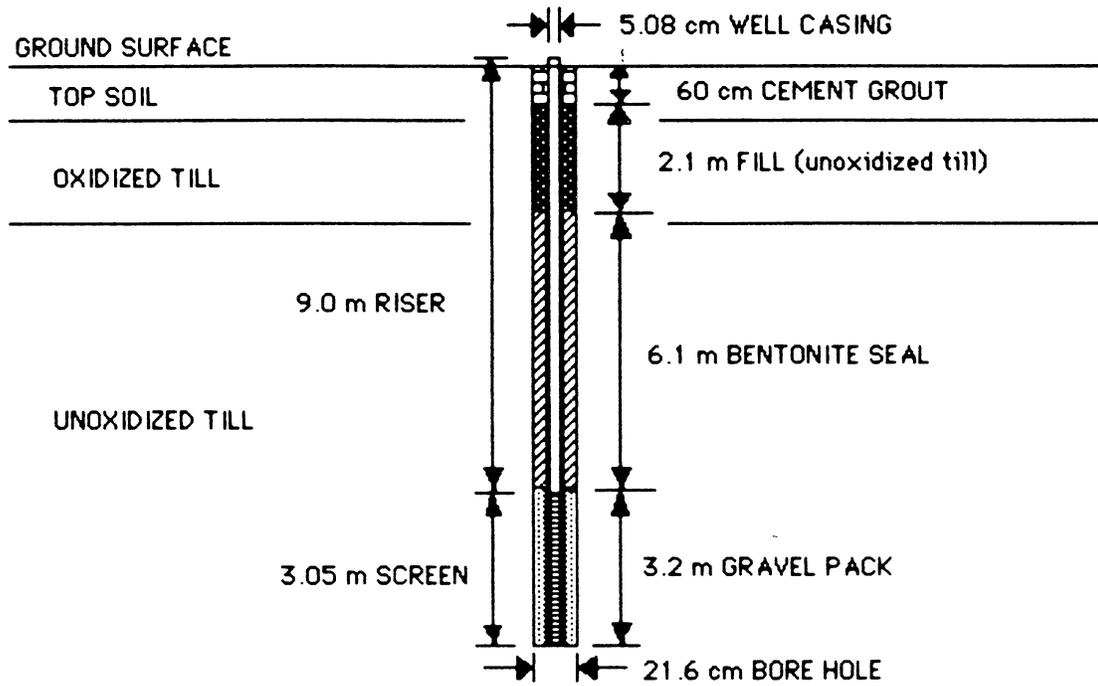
Vertical cross-section of wells IW-1 and MW-1 (not to scale)
